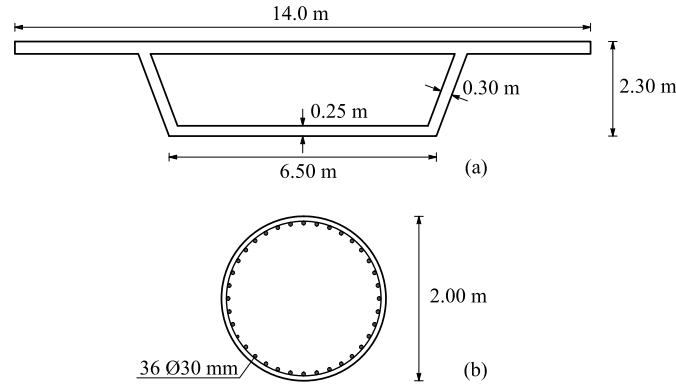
RC bridge: (a) deck cross-section; (b) pier cross-section, with reinforcement layout.
